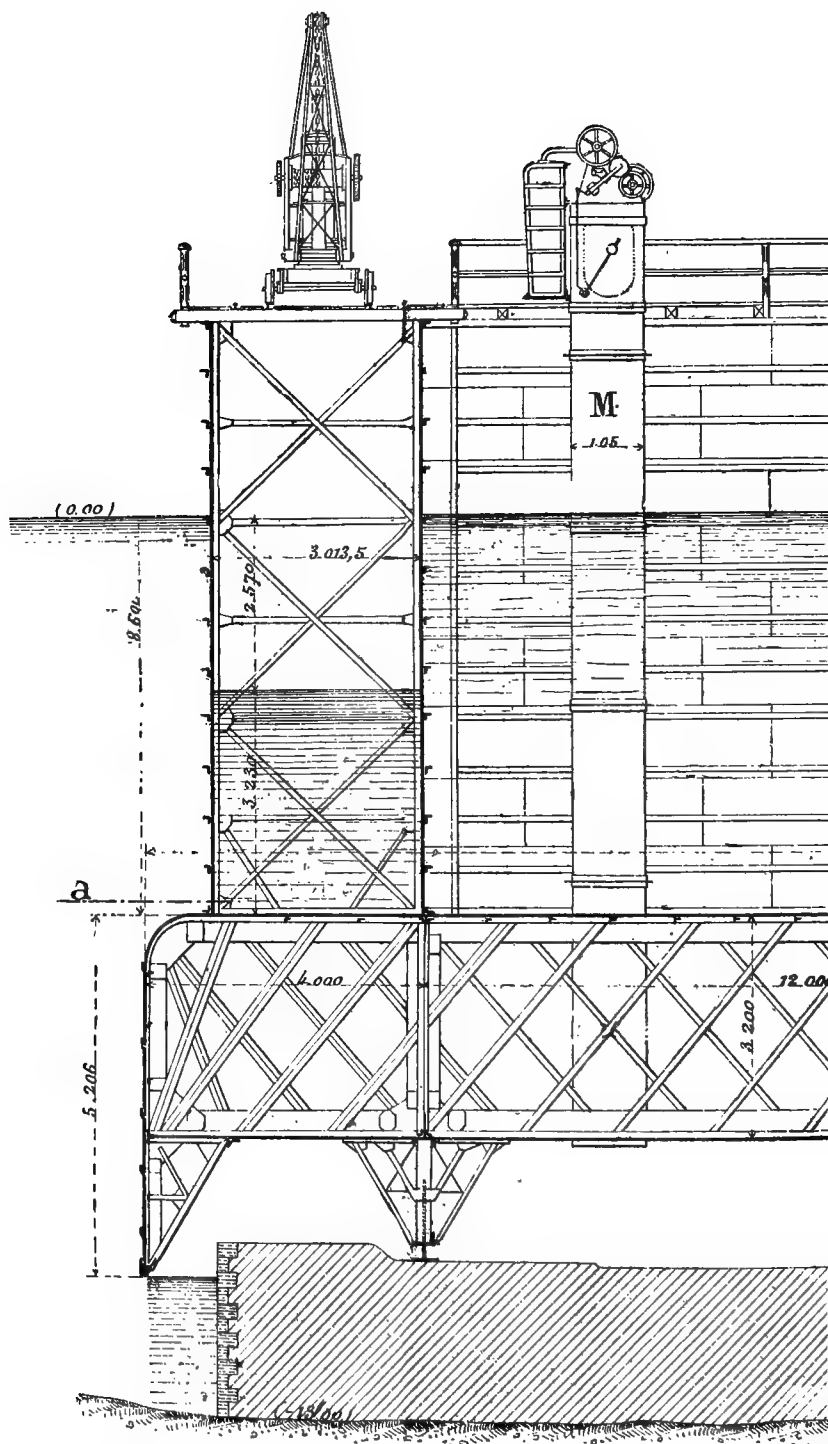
Great floating caisson used in laying the flooring of dock No. 2; transverse section. 0.70 meter; C, Shaft for the béton, 0.45 m.
